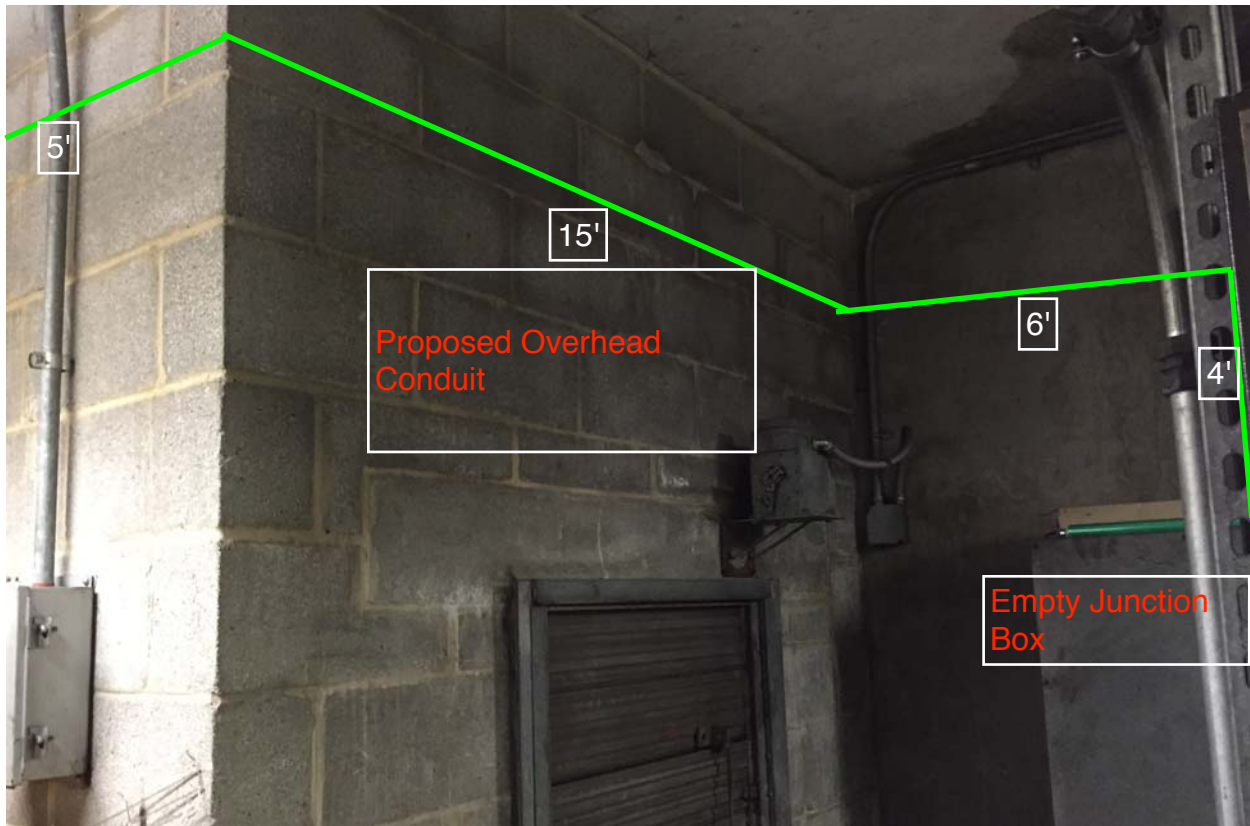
Proposed overhead conduit in Elevator Machine Room 205
